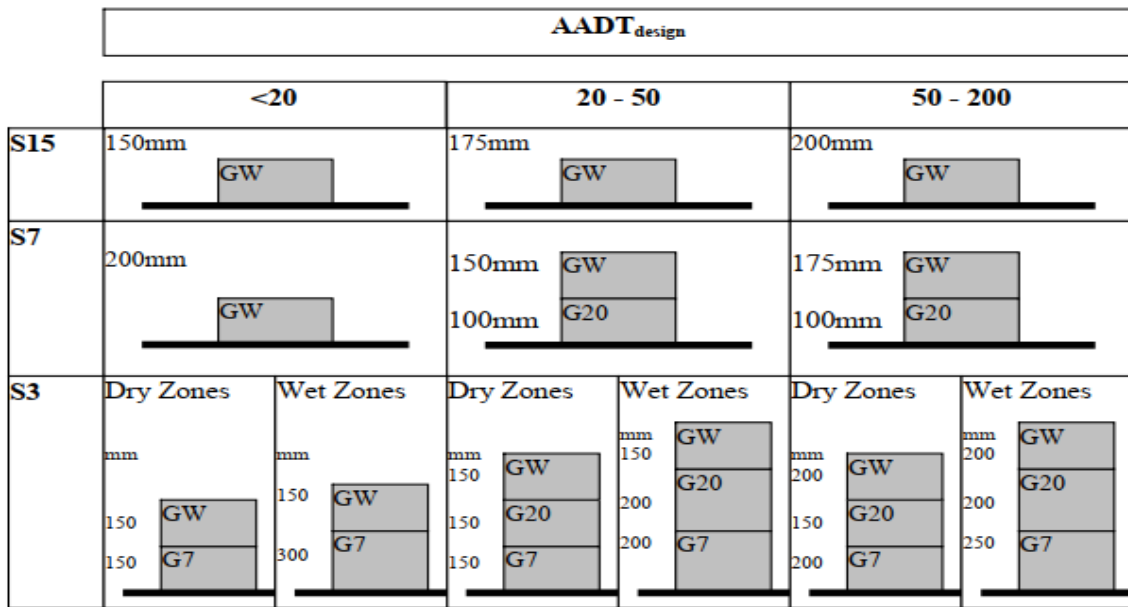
Pavement and Improved Subgrade for Gravel Roads for AADTs <200 (Source: ERA Geometric Design Manual -2002).
